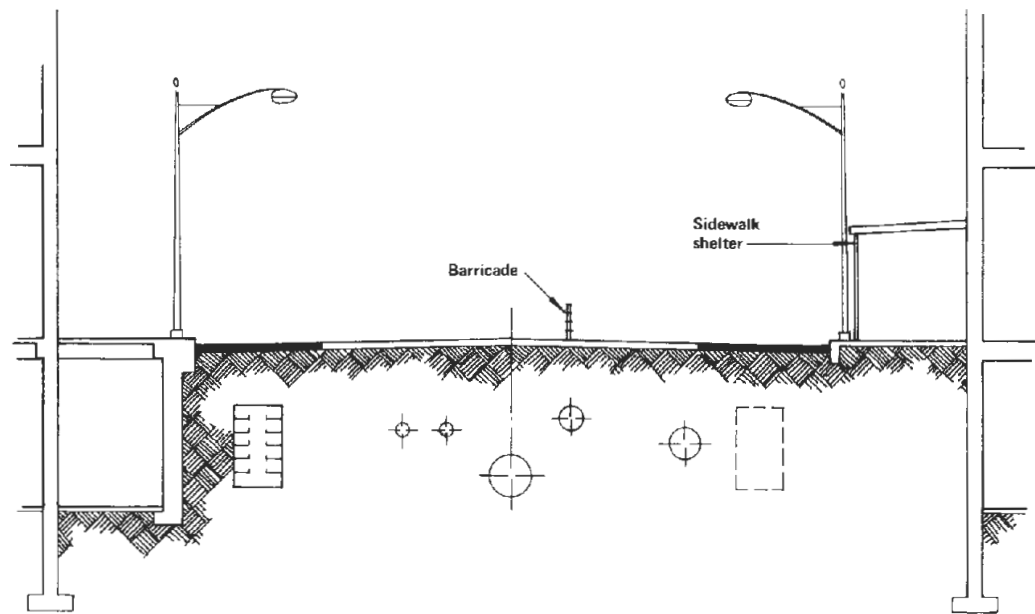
Step 4: Erect sidewalk shelter and barricades on one side of street.
